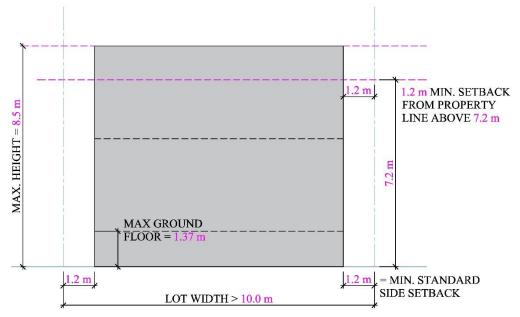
K.F4: Flat Roof Building with Side Yard Setback of 1.2 Metres
